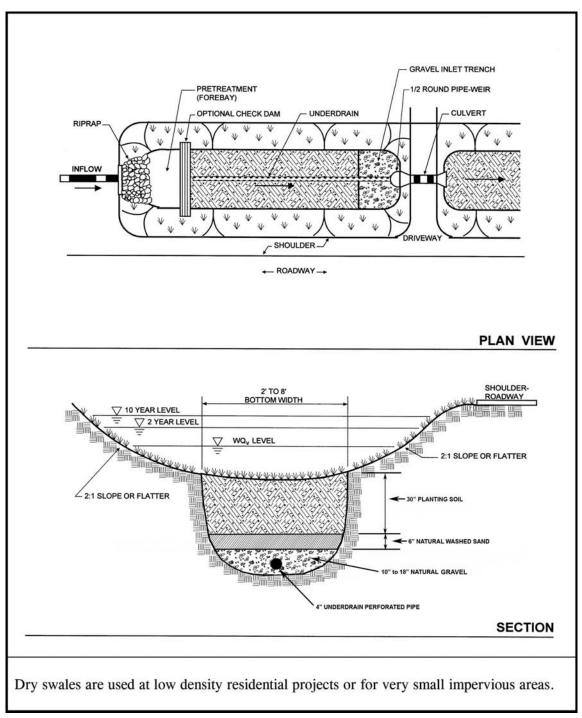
Dry Swale Source: Maryland Stormwater Design Manual
